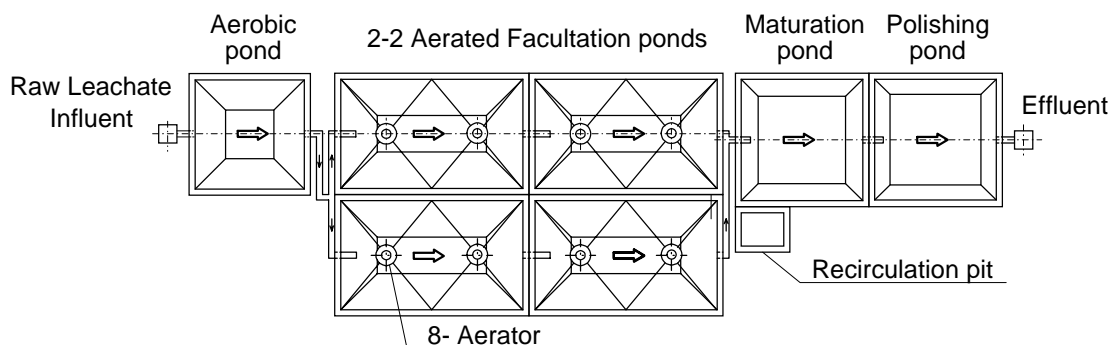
Layout of Proposed Leachate Treatment Facility in Cimsa
